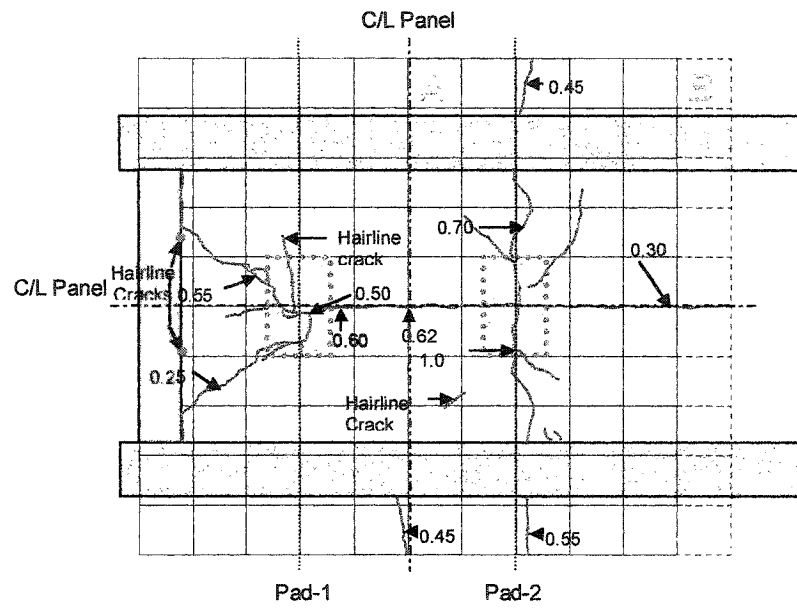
Panel-A: Crack pattern on Soffit after 900 Load Cycles
